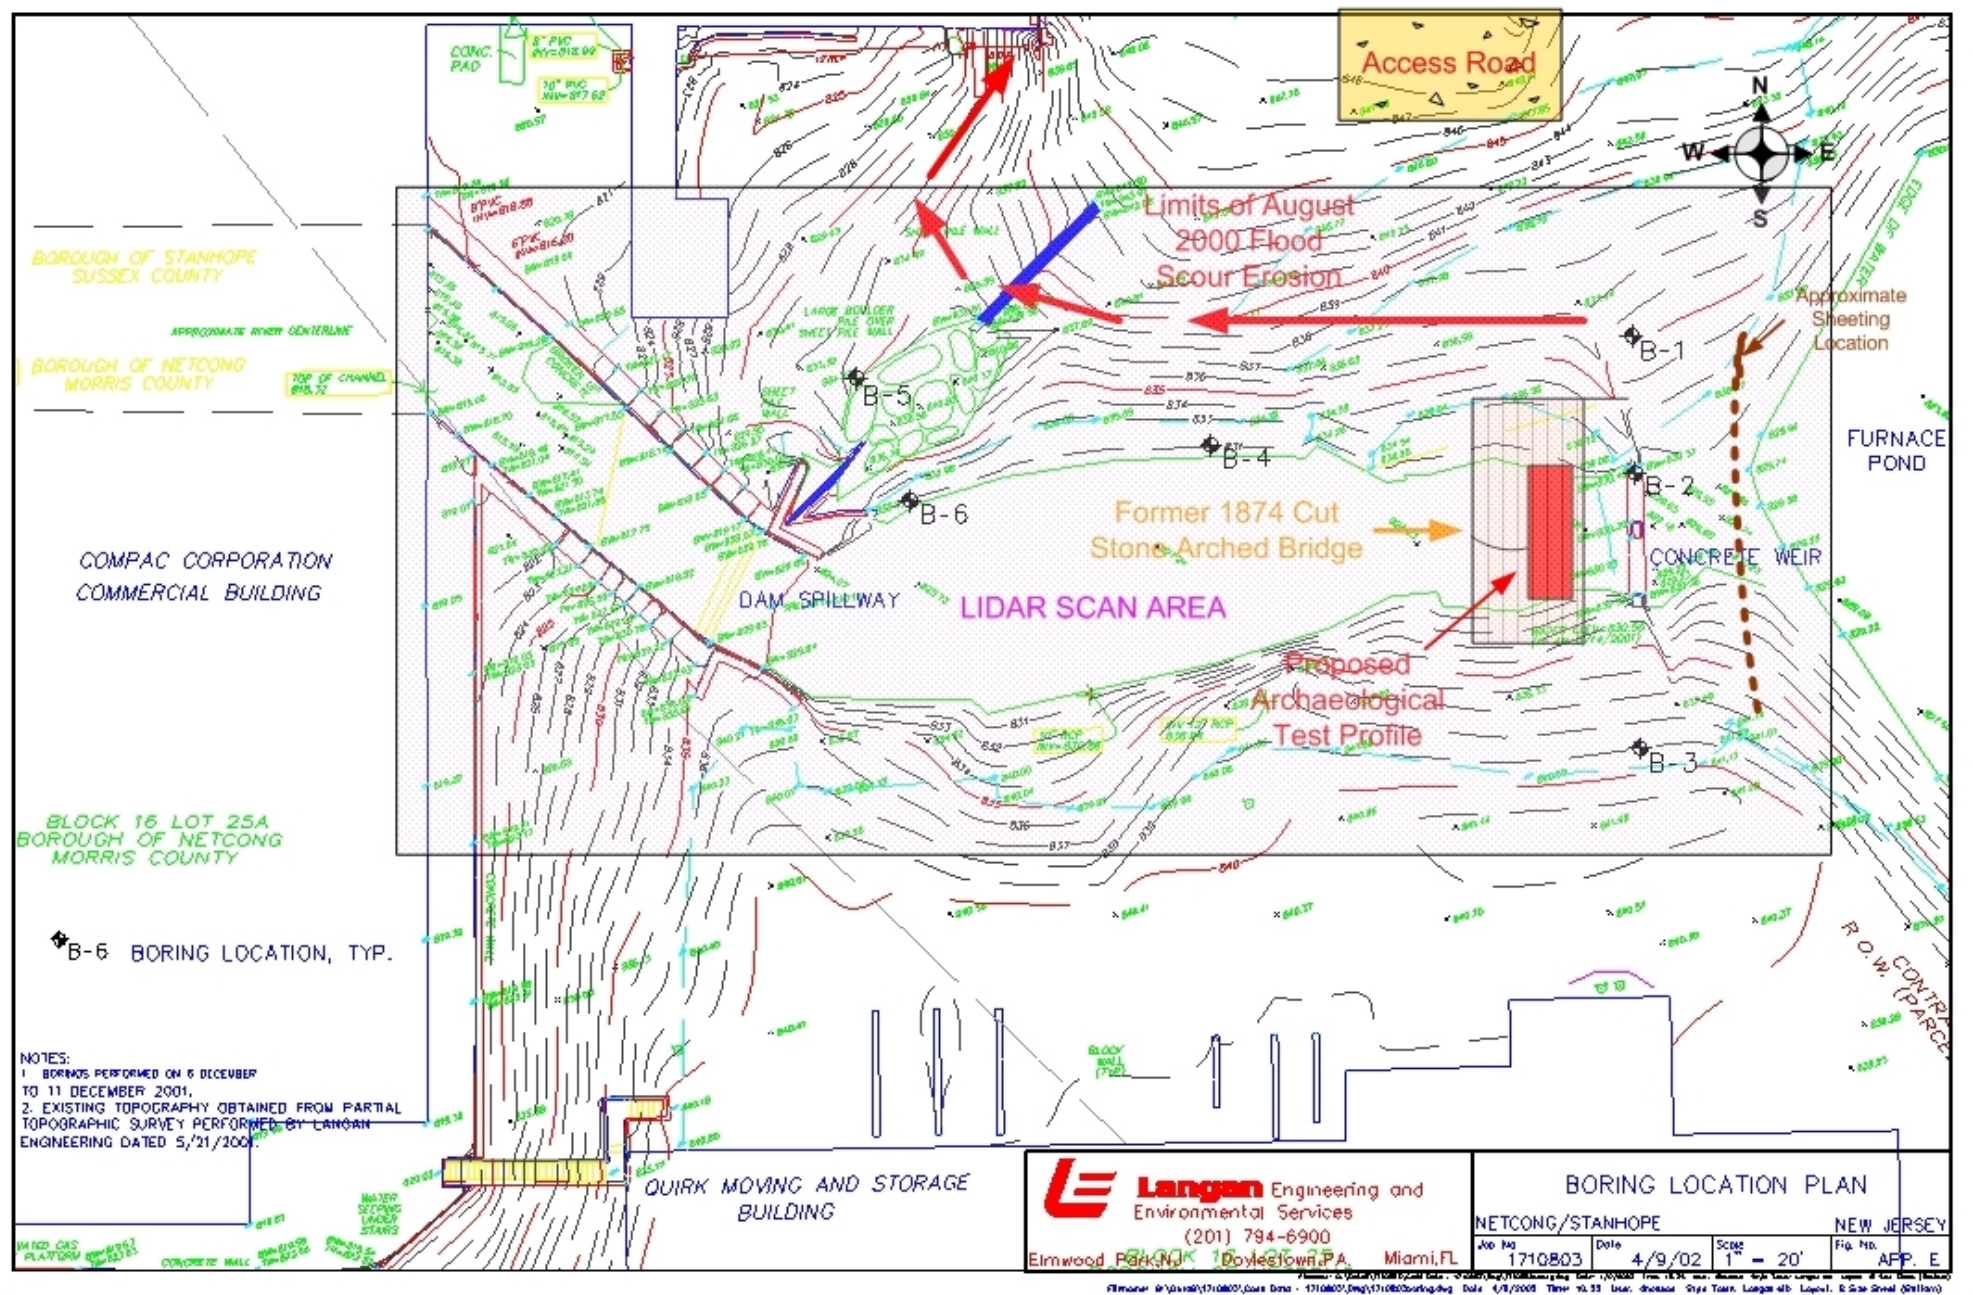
Project Plan of Furnace Pond Falls showing topography, zone of deep flood scour damage, locations of Langan test borings, proposed LIDAR 3D scan area, relocated sheeting plan, proposed N-S archaeological profile cut and former 1874 stone bridge.
